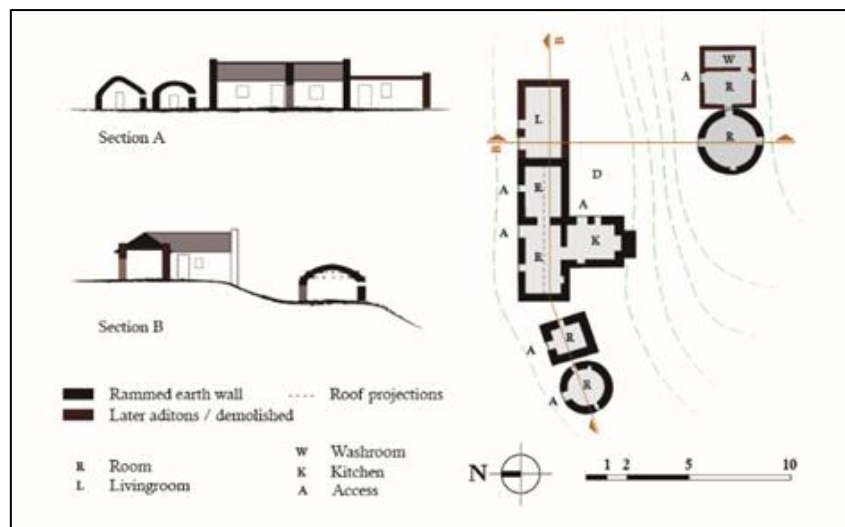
Plan and Section of identified Vernacular Building at Latitude 33.6°S (26)
